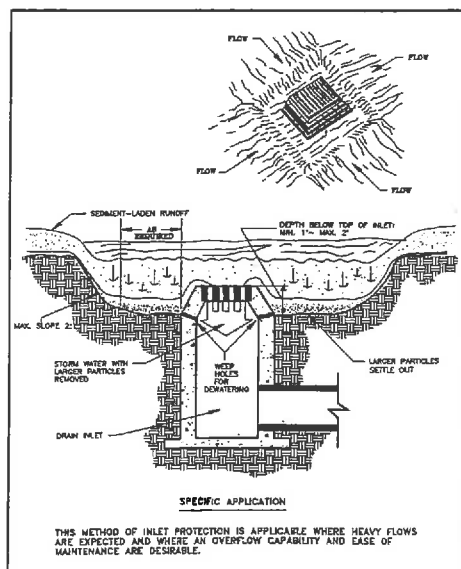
Excavated Drop Inlet Sediment Trap
